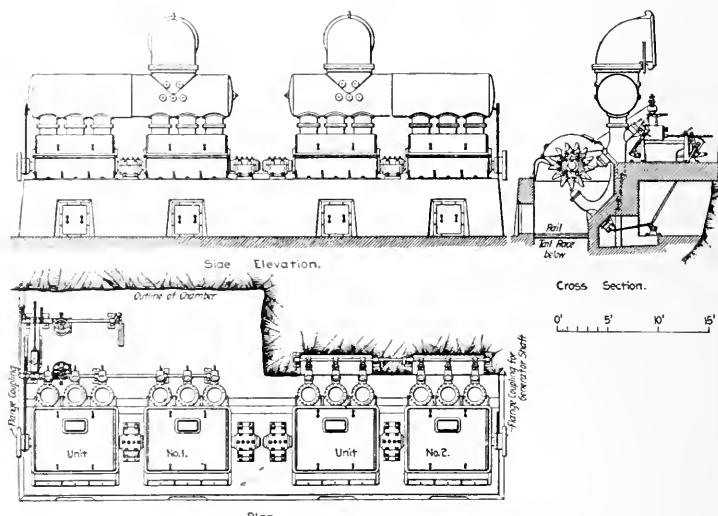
ELEVATION AND SECTION OF WATER MOTORS.
